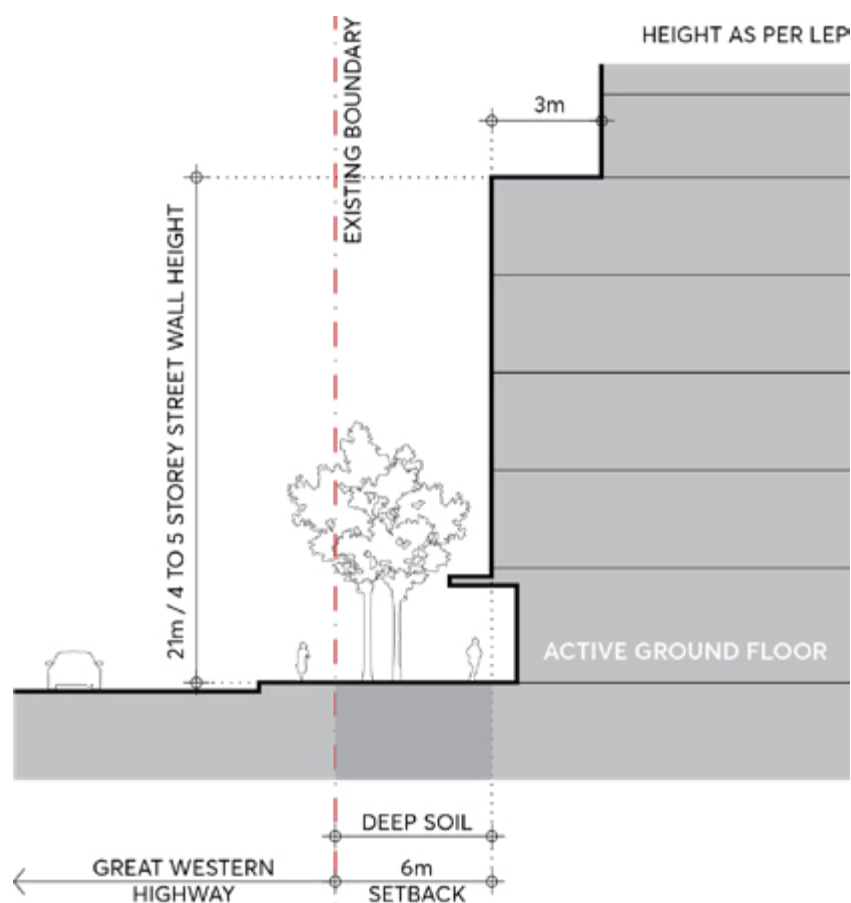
Street Setbacks to Great Western Highway
